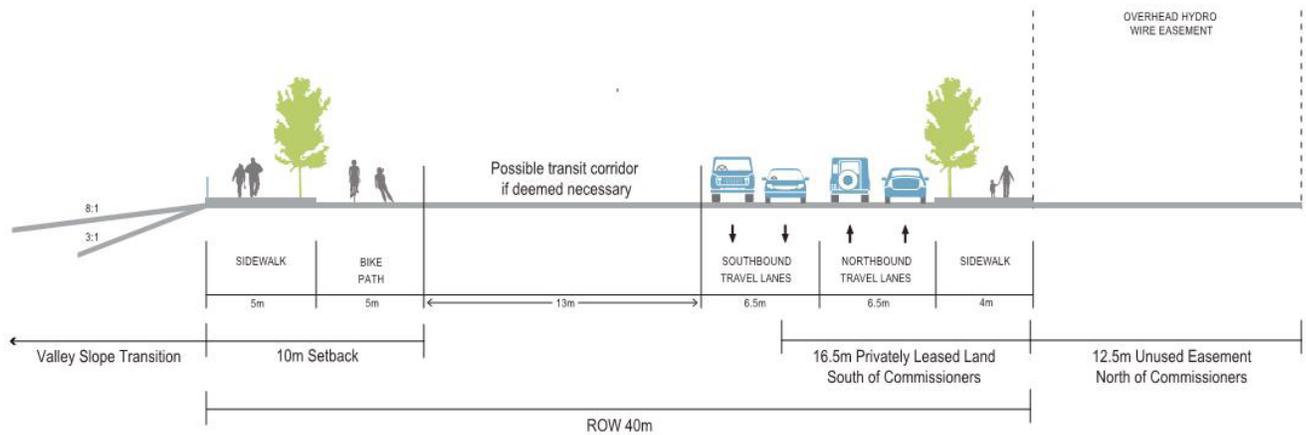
Cross section for Don Roadway between Lake Shore Boulevard East and the ship channel
